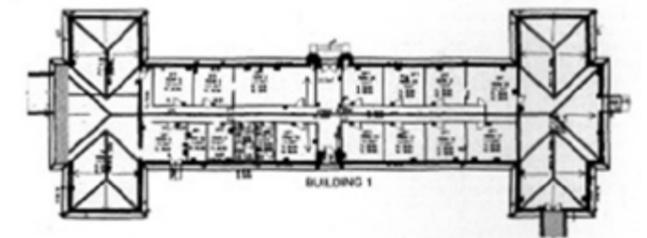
Plan of the engineering school brick buildings, constructed in 1941
